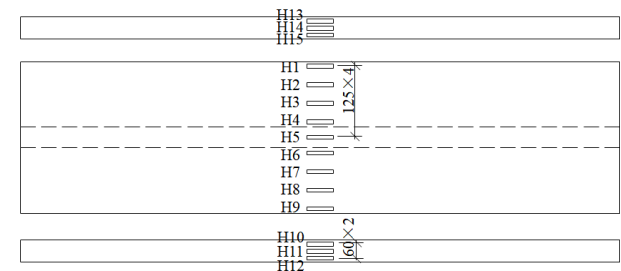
Arrangement of strain gauges on the surface of concrete floor slab
